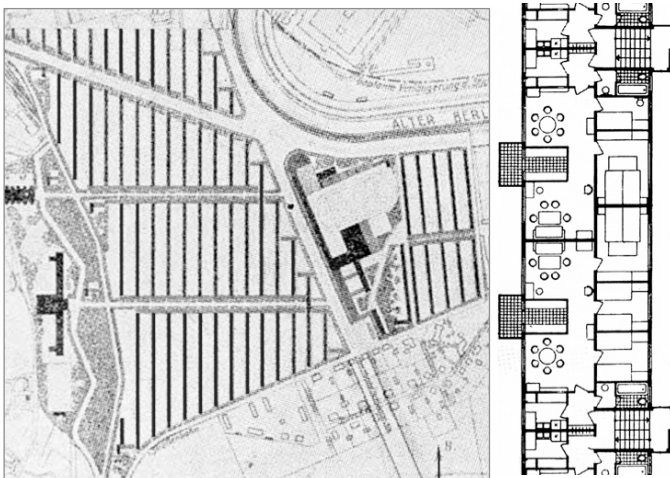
Otto Haesler and Carl Völker, entry for the 1929 Haselhorst competition, fourth prize, site and typical floor plan.
